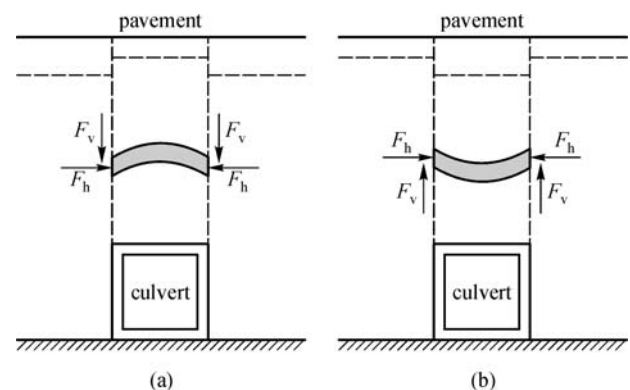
Load transfer within fill-structure system. (a) Embankment installation; (b) trench installation
